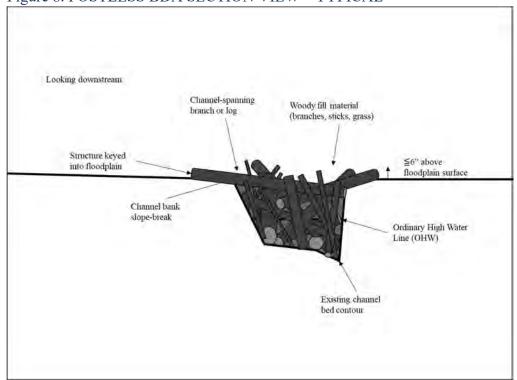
POSTLESS BDA SECTION VIEW – TYPICAL
